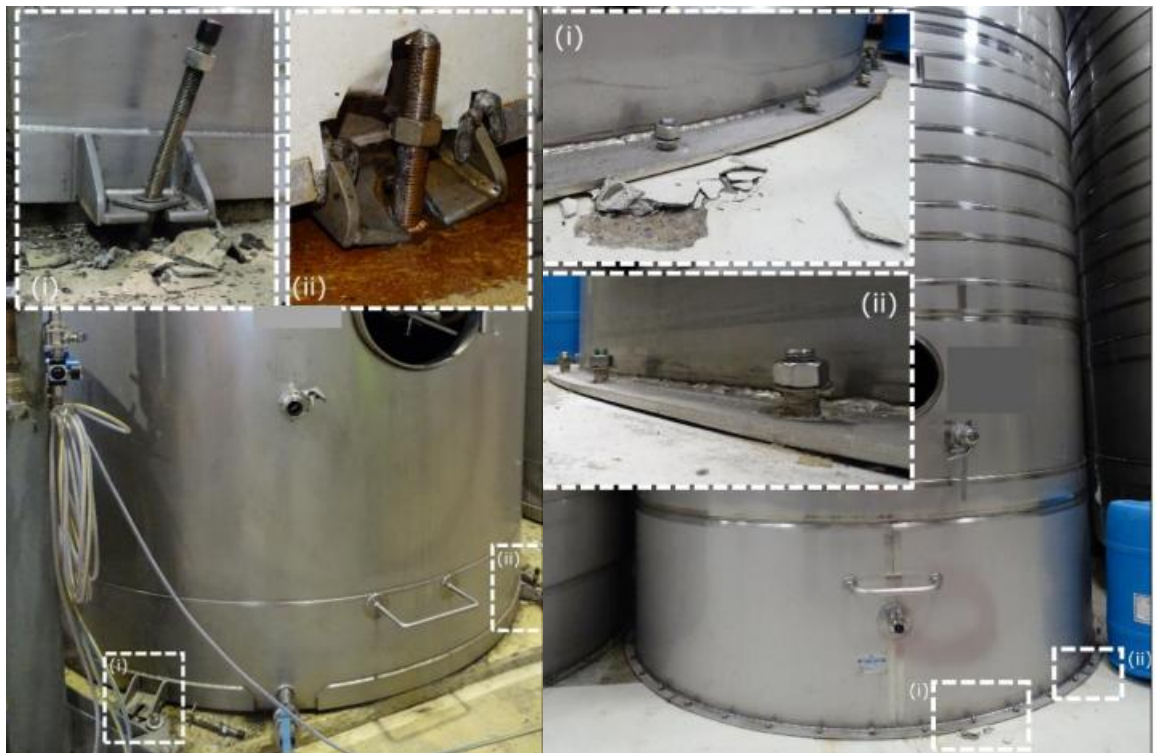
Pull-out of anchors from concrete and yielding, rupture and compression failure of anchor rod (Dizhur et al., 2017)
